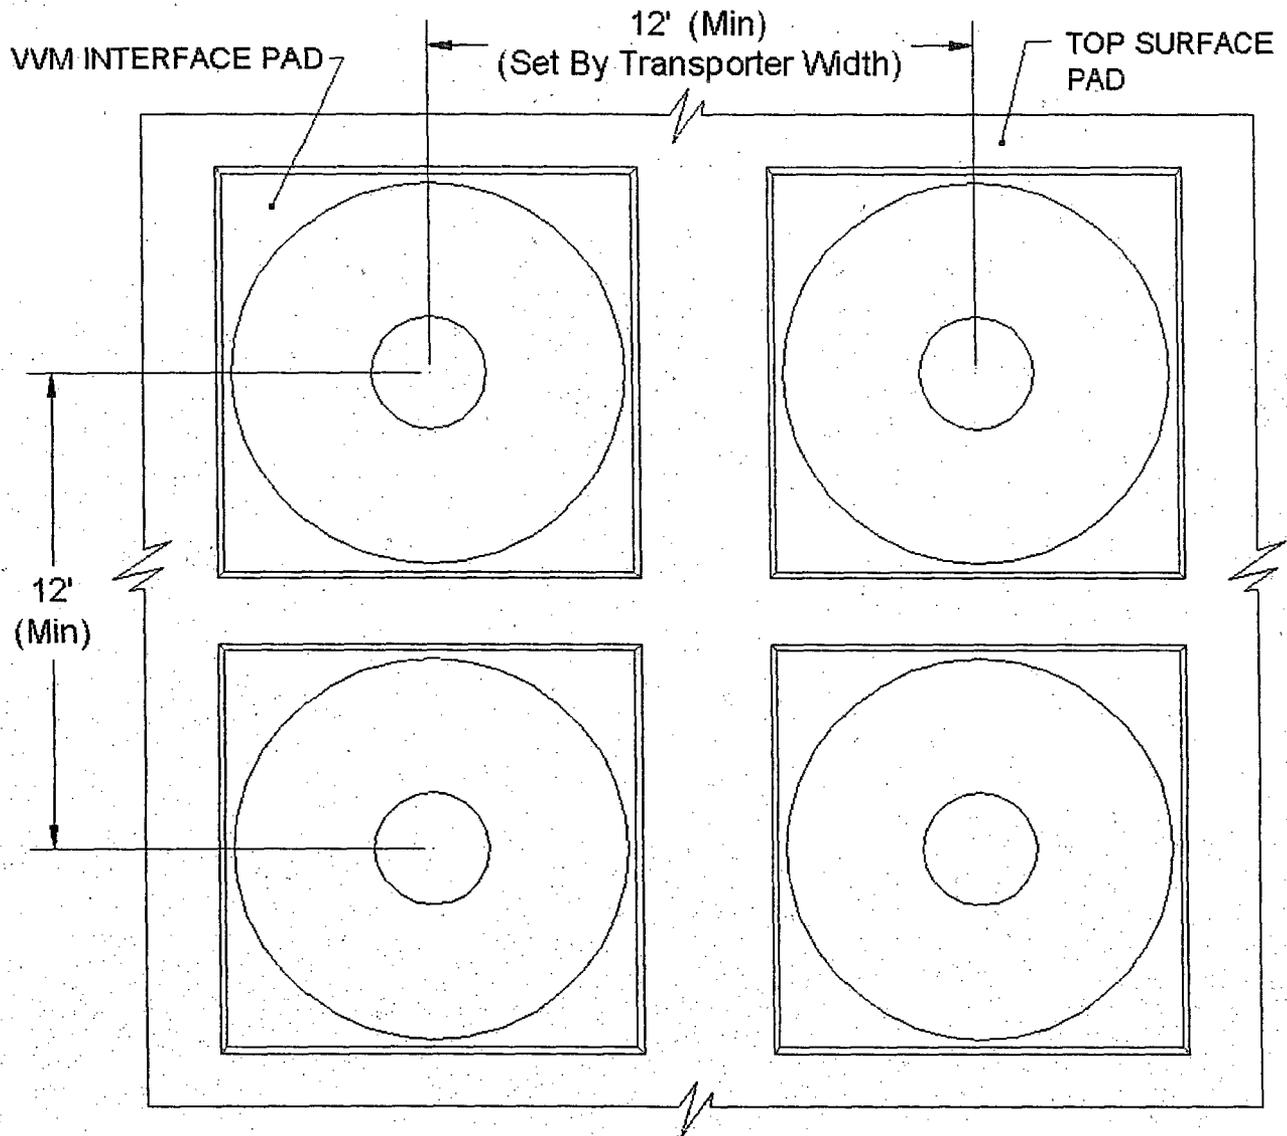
PLAN VIEW OF A 2X2 HI-STORM 100U SYSTEM STORAGE ARRAY
